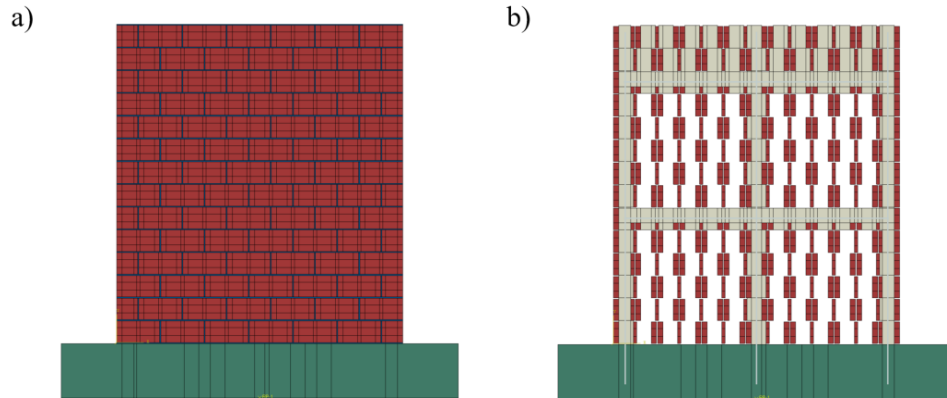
Masonry Model Layers (a) Masonry Layer (b) Grout Layer
